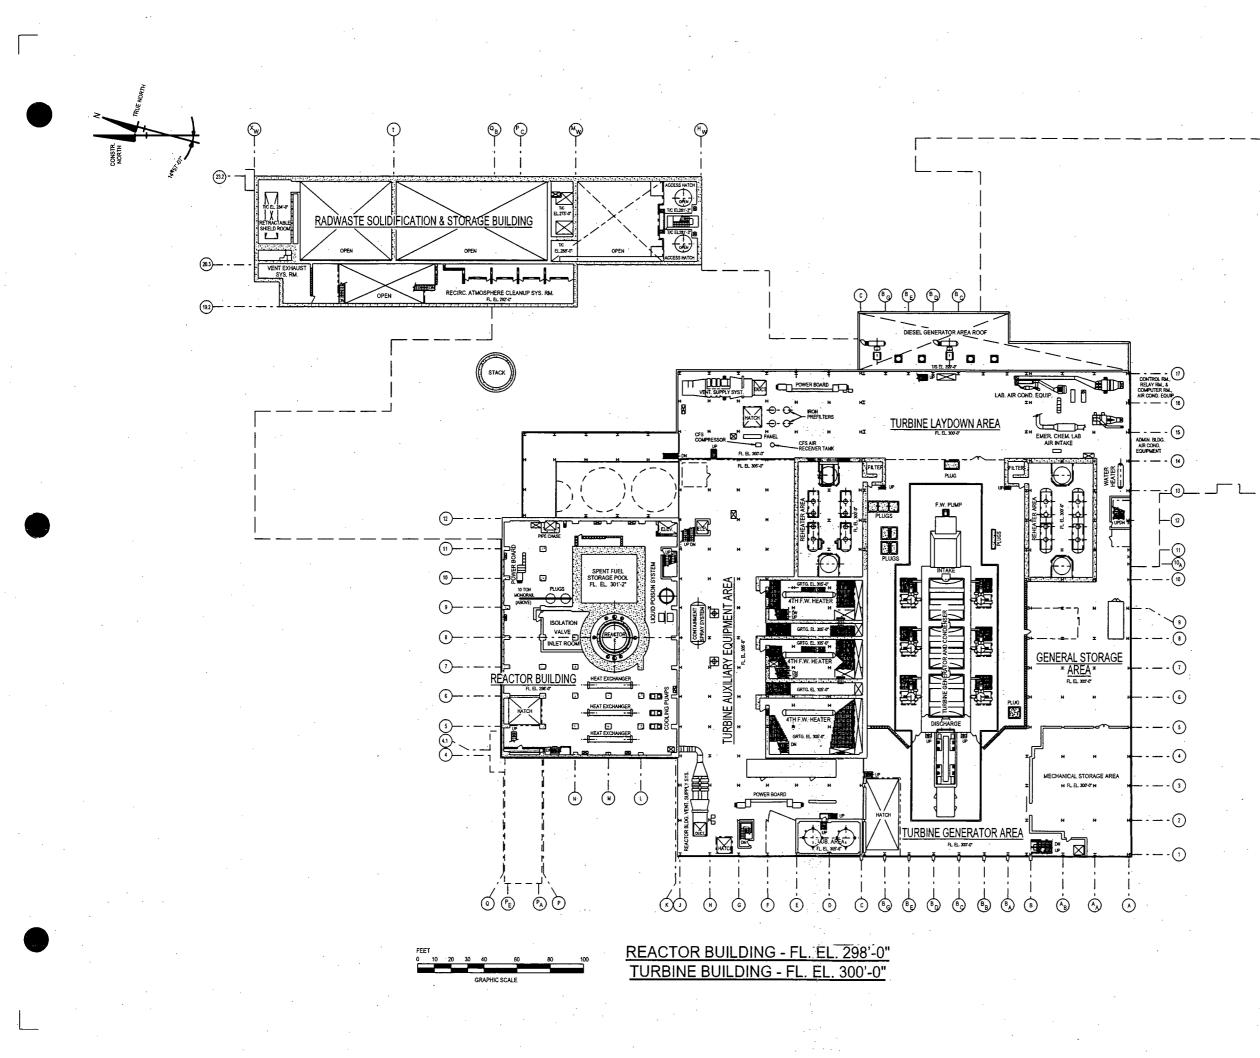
UFSAR Rev. 20 (October 2007) Statation Floor Plan - El. 298'-0" & 300'-0"
